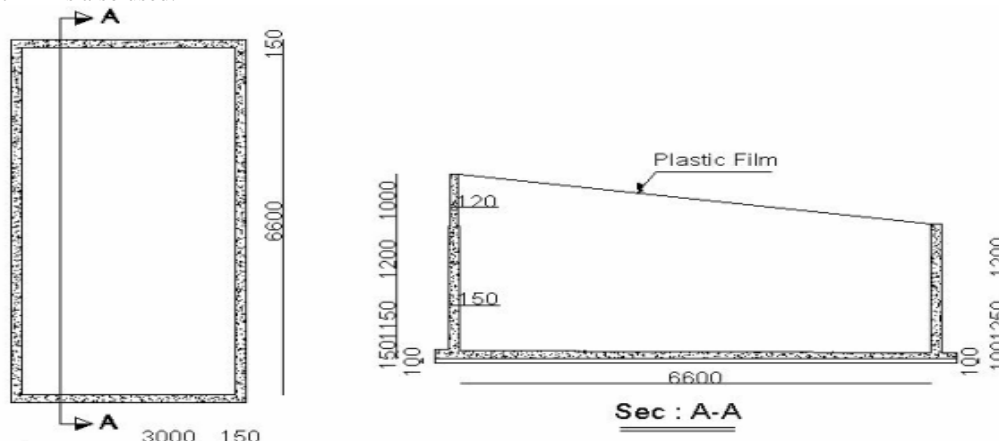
Ichnography and Section Plane of Water Deposited Pond
